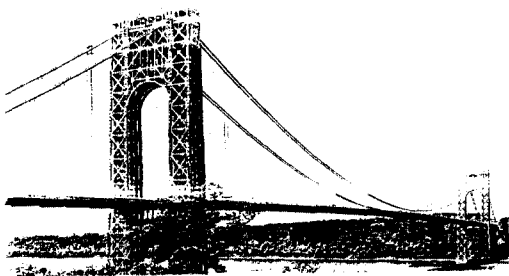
The George Washington Bridge, as completed in 1931 with a single deck(courtesy of special Archive, Triborough Bridge and Tunnel Authority)
